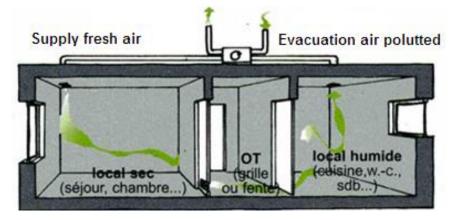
Circulation of air flows inside the building (double-flow mechanical ventilation heat recovery unit)
